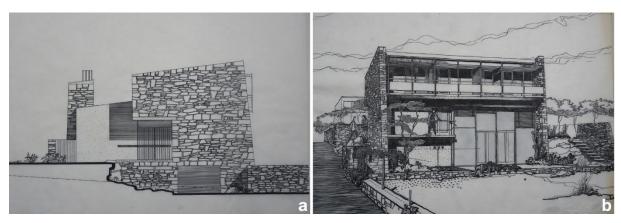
Elevation drawings of an architectural concept for a single-family house in Italy by Ewa and Marek Dziekoński, location unknown, 1968. Sources: Private archive of architect Ewa Dziekońska.
